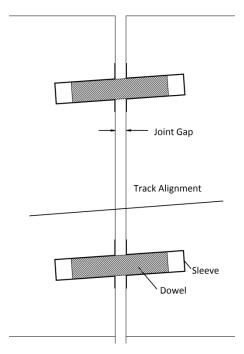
Detail of Dowels in One Column Cap Beam
